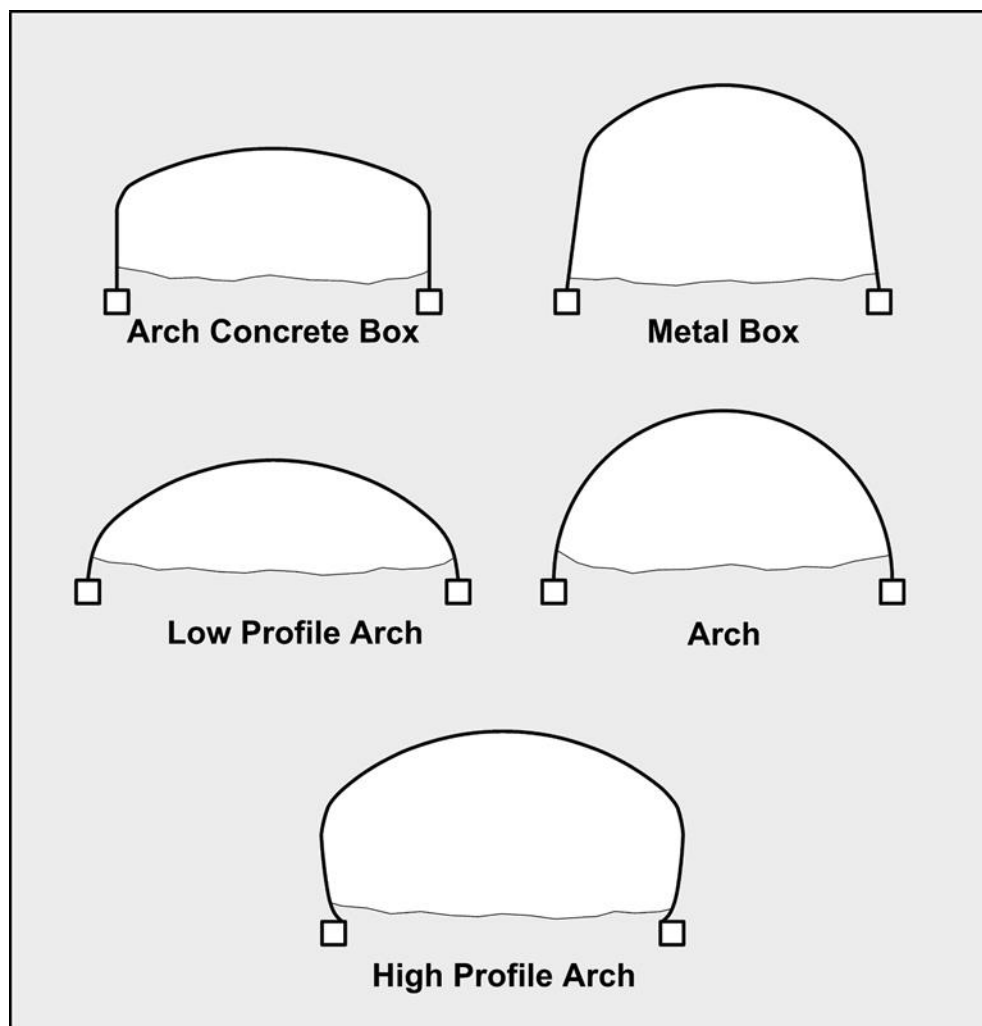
Commonly used open-bottom culvert shapes (7-6)
